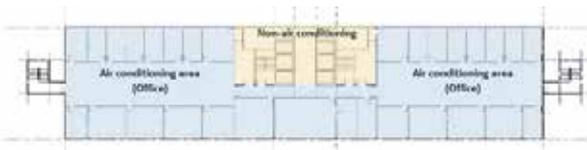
Typical upper floor plan of Buildings 1 and 2 with two different thermal zones.
